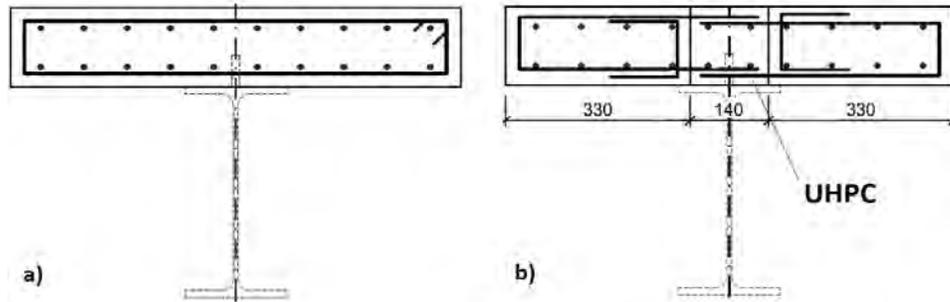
Cross-section of the beams a) cast in situ slab (type 1), b) precast slab with the joint (type 2)
